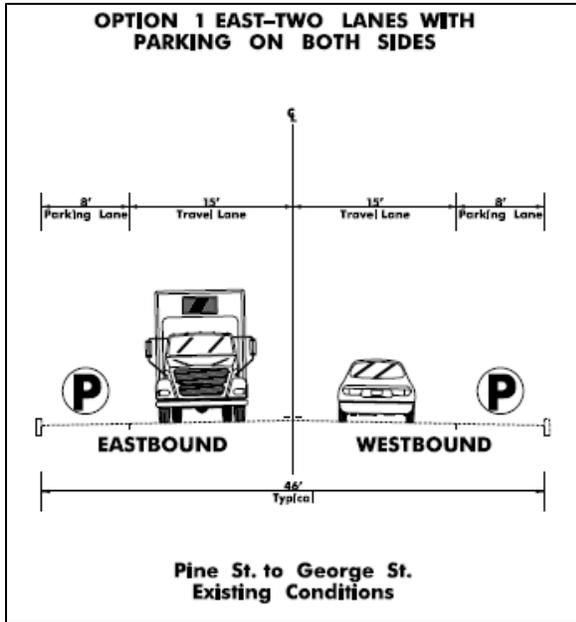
Two-Lane Roadway Cross Section with Parking on Both Sides – East
